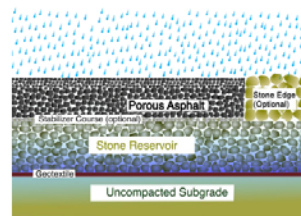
Typical porous asphalt pavement with stone reservoir cross section
